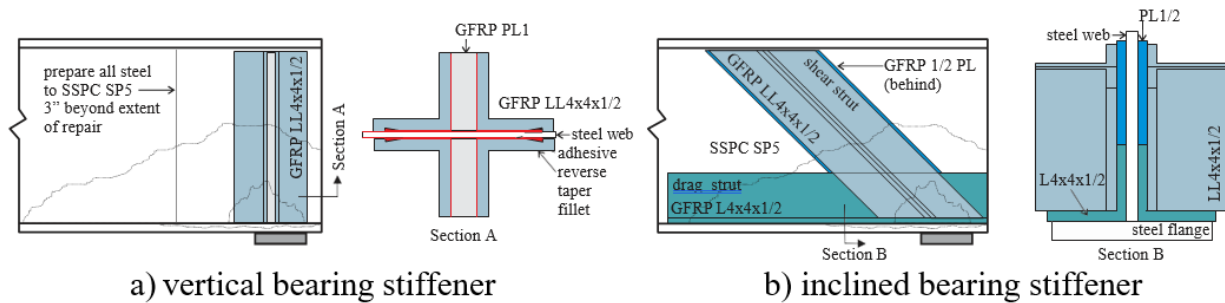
Adhesive Bonded FRP Repairs for Rolled Girders
